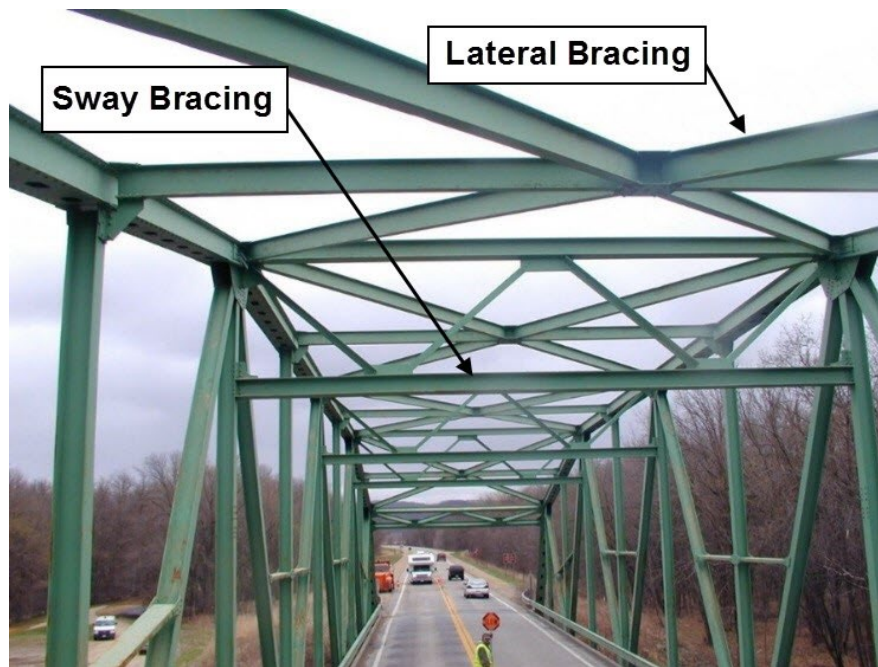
Top Lateral Bracing and Sway Bracing
